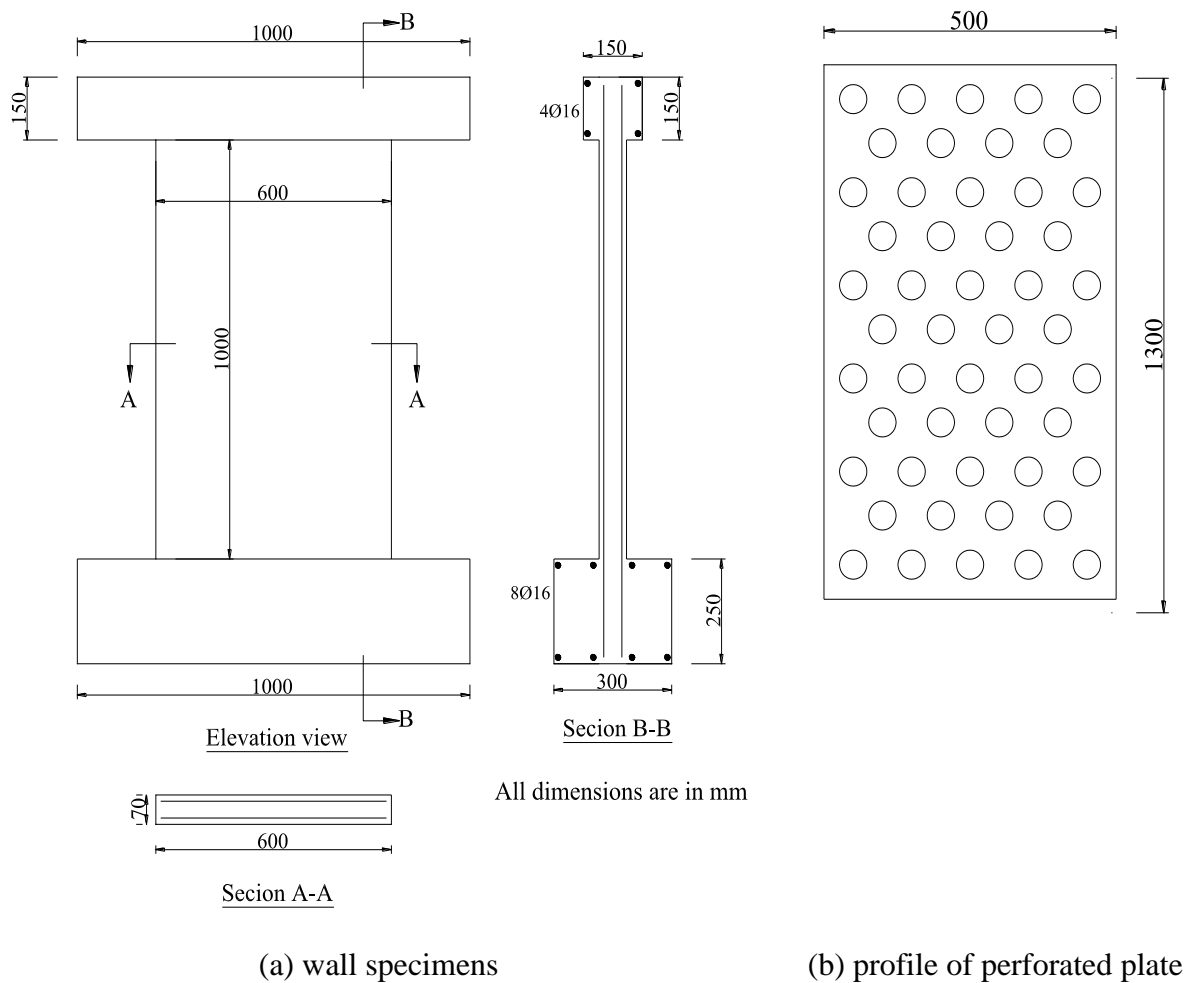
Steel perforated structural walls tested by Khaloo and Shokoufi (2002)
